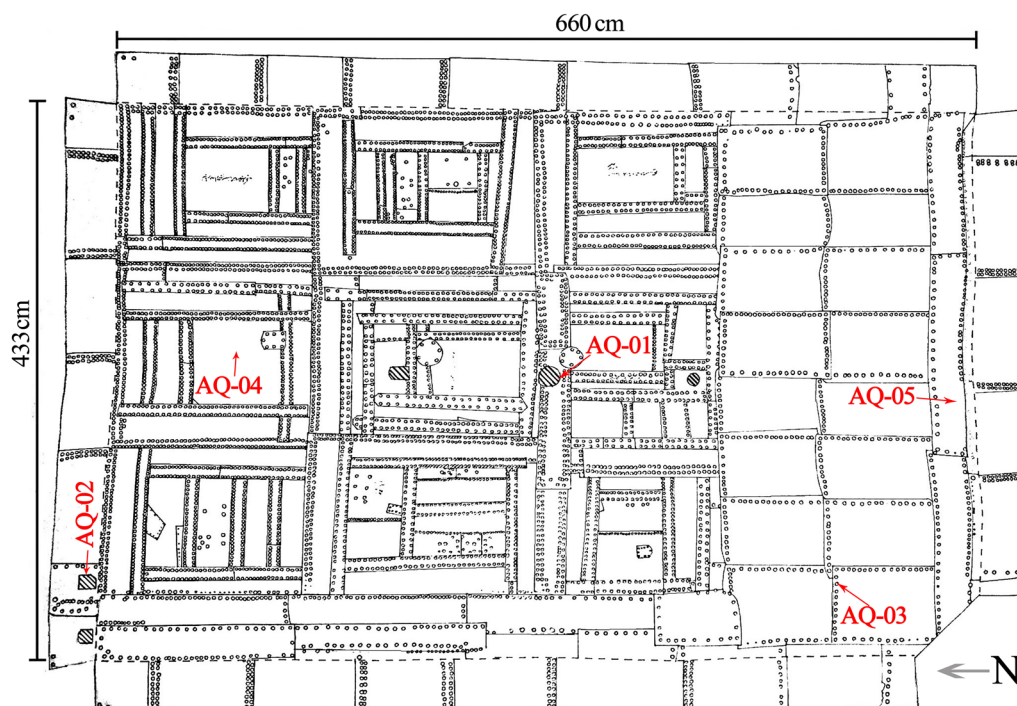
Technical drawing and details of the metal sheets of the pool of the Ali Qapu Palace and marked places of sampling for analytical works
